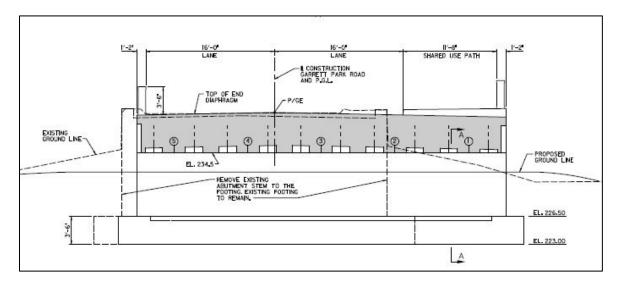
Garrett Park Road west of Schuylkill Road (Looking East)
